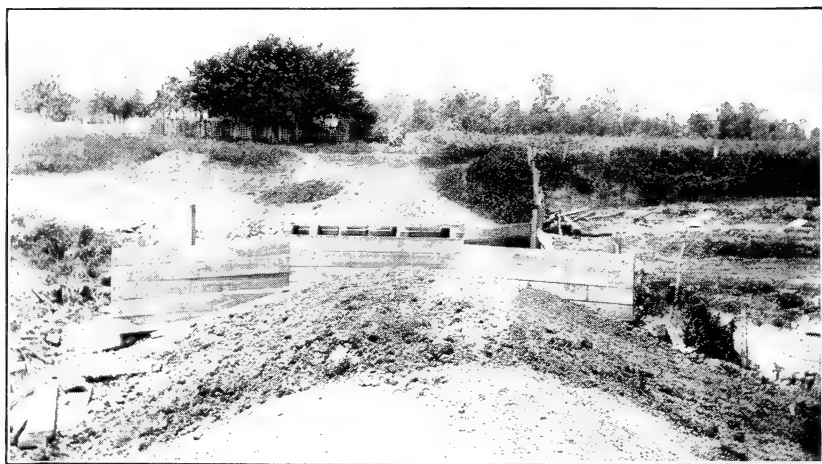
View across Bayou Walnut showing wing walls of spillway and bridge over spillway box.
